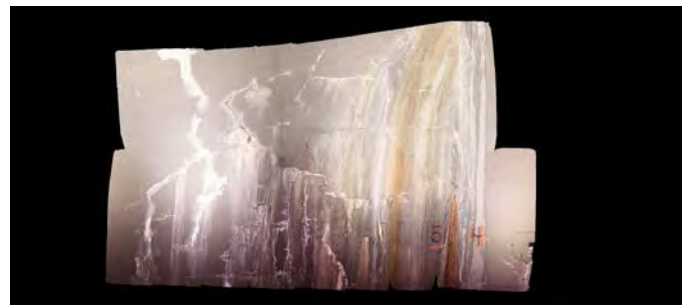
Clean air supply duct, south-west ventilation building, view of south lining wall from within duct.
